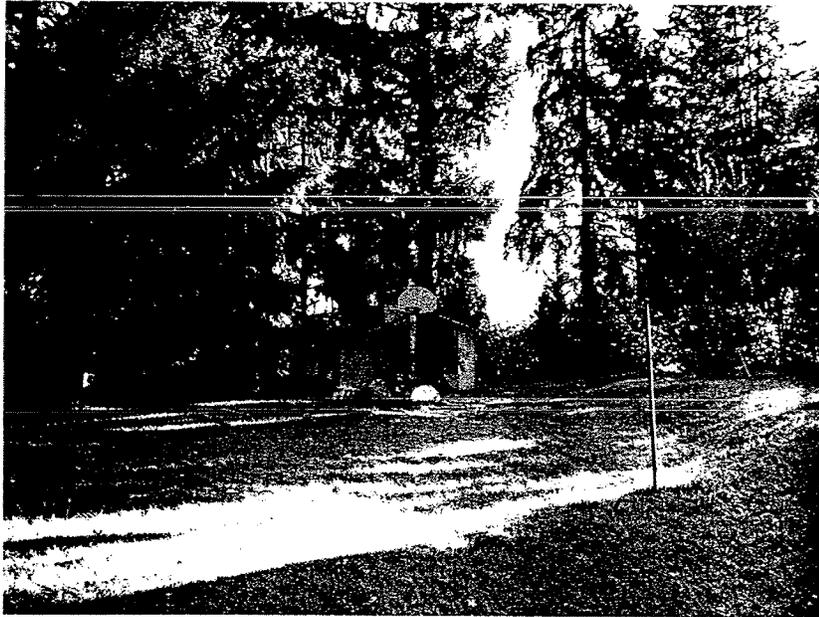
GRAVEL ROAD AND STEEP SLOPE
